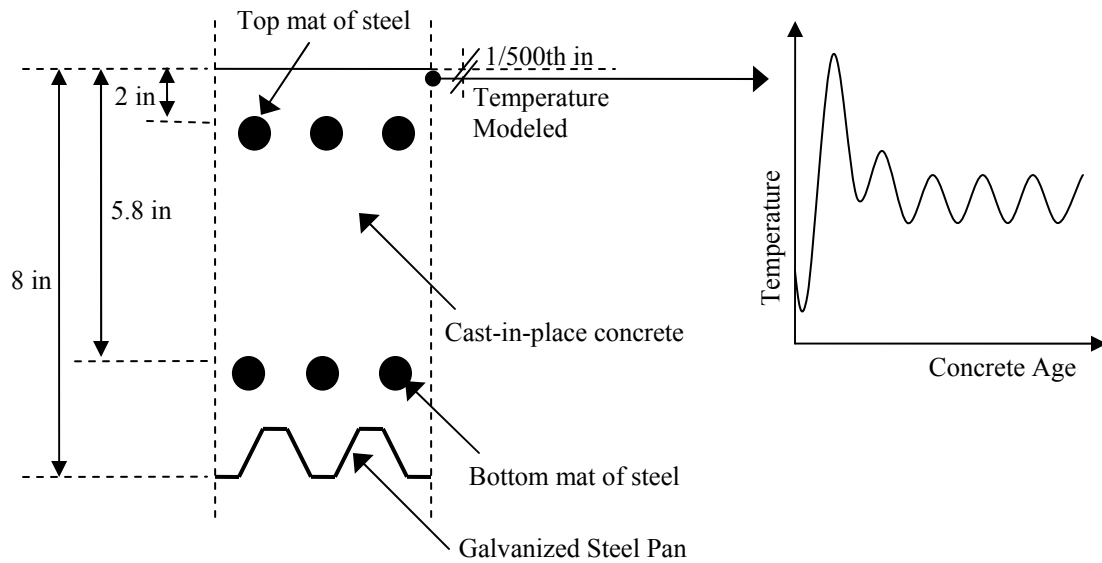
Schematic of deck geometry used to model the concrete (Concrete Works Version 2.01, User's Manual)
